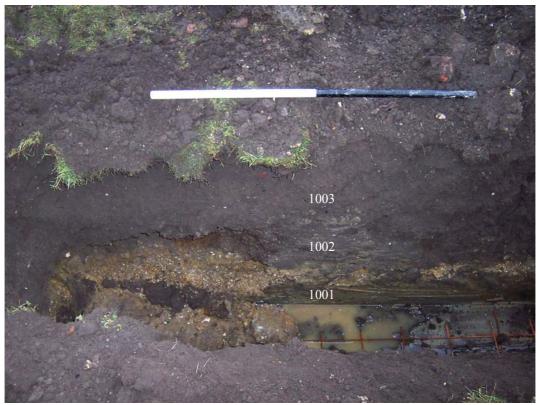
View showing the nature of the deposits revealed throughout the foundation trench system
